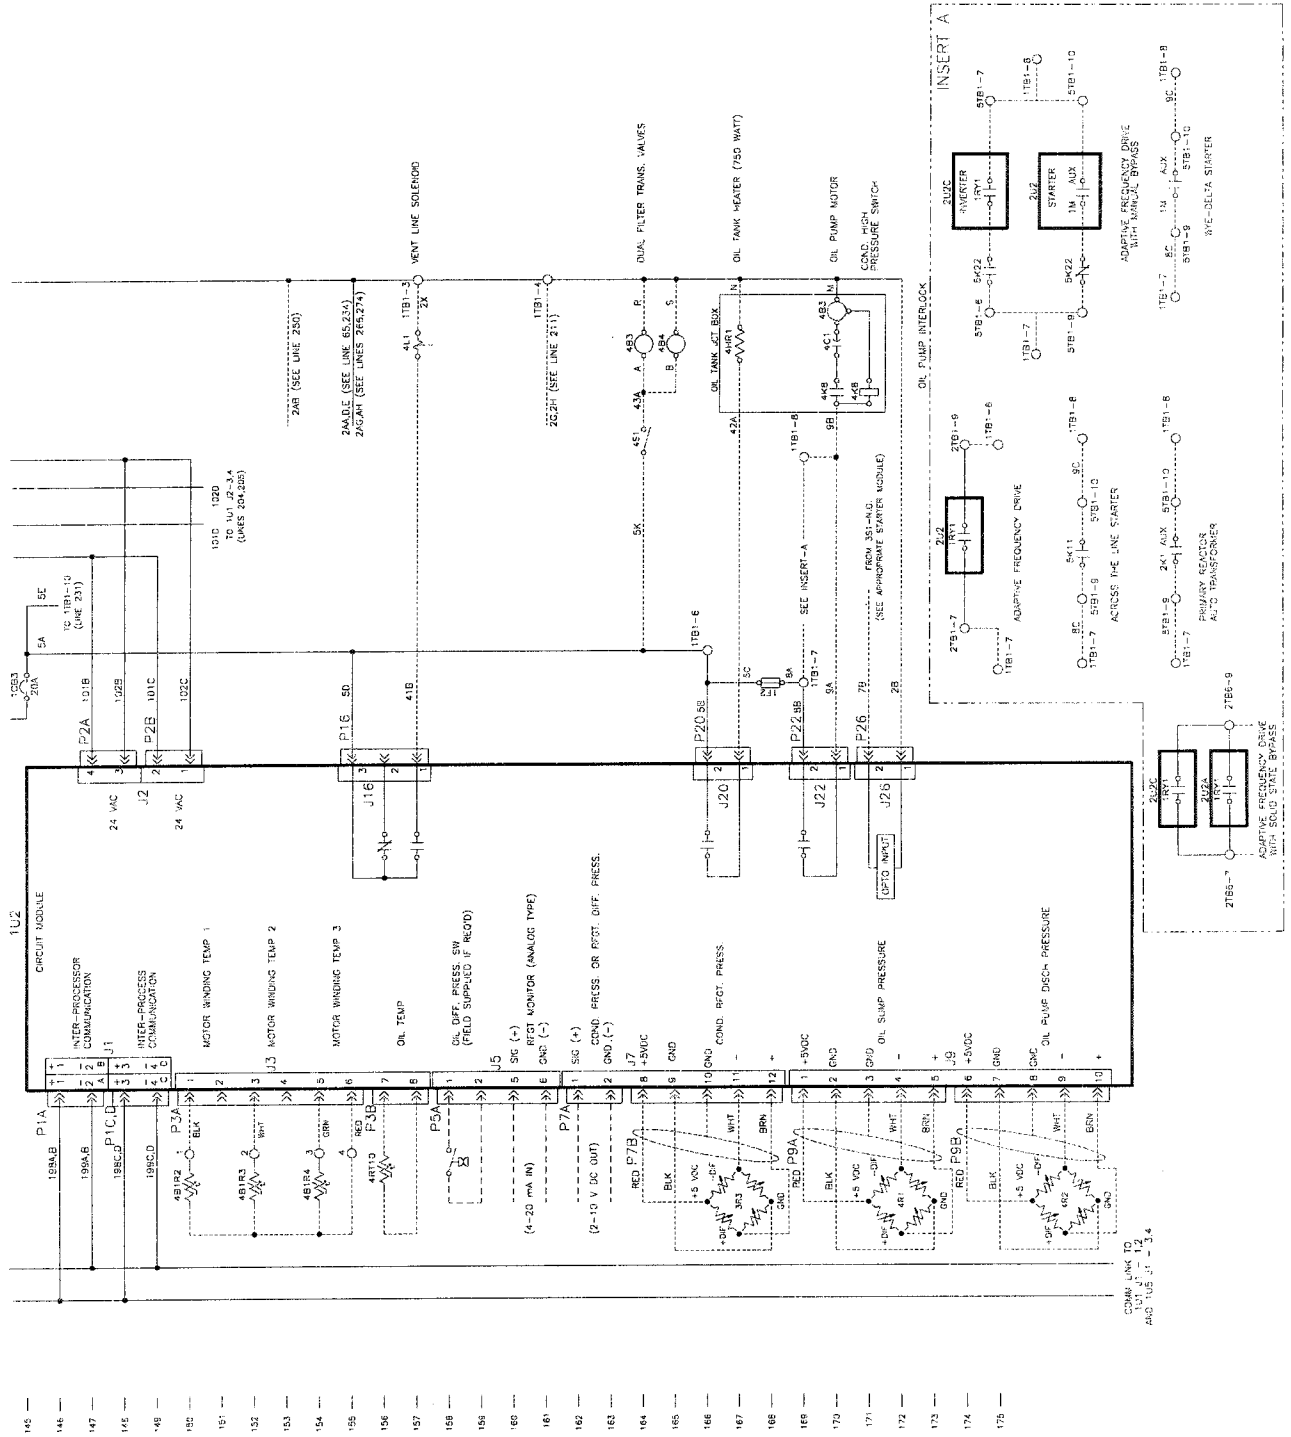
UCP2 Schematic Wiring Diagram for Chiller, Tracer Comm, Printer, and IPCB
